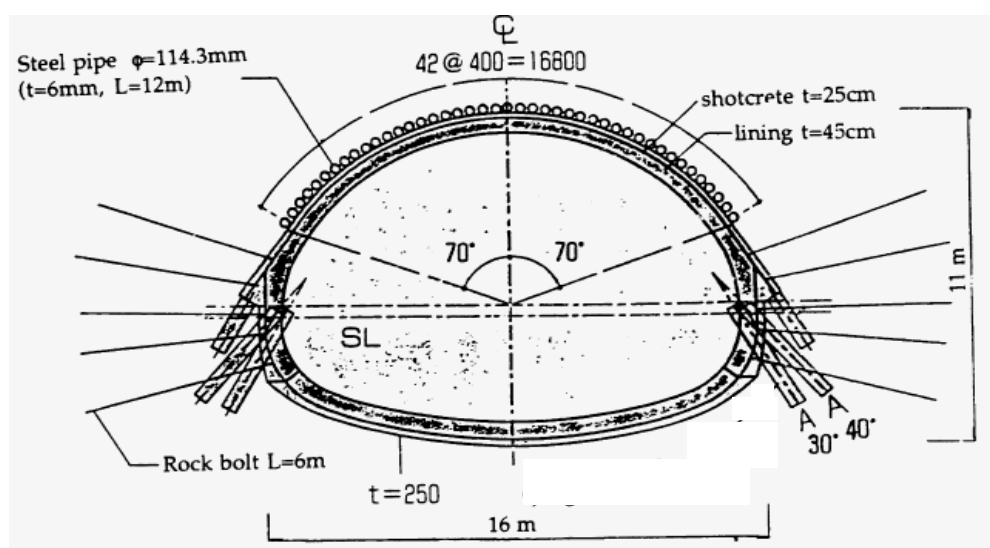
Cross sectional view of Maiko Tunnel under Fukuda Junior High School.
